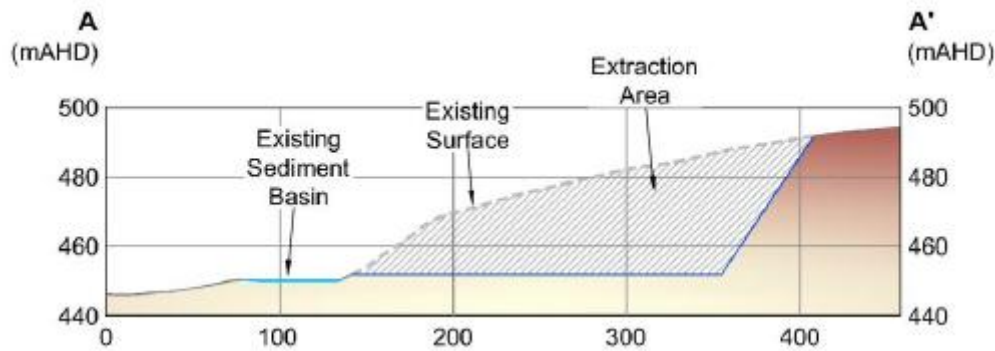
Proposed Extraction Section – Northwest to Southeast (extract from applicant's EIS)
